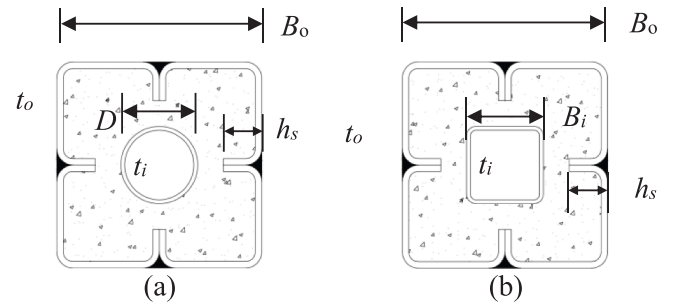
Cross-sections of CFD-SSST columns with (a) circular and (b) square inner steel sections.
